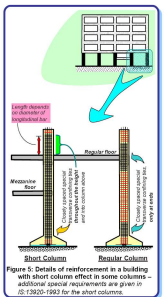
Details of reinforcement in a building with short column effect in some columns – additional special requirements are given in IS 13920-1993 for the short columns.
